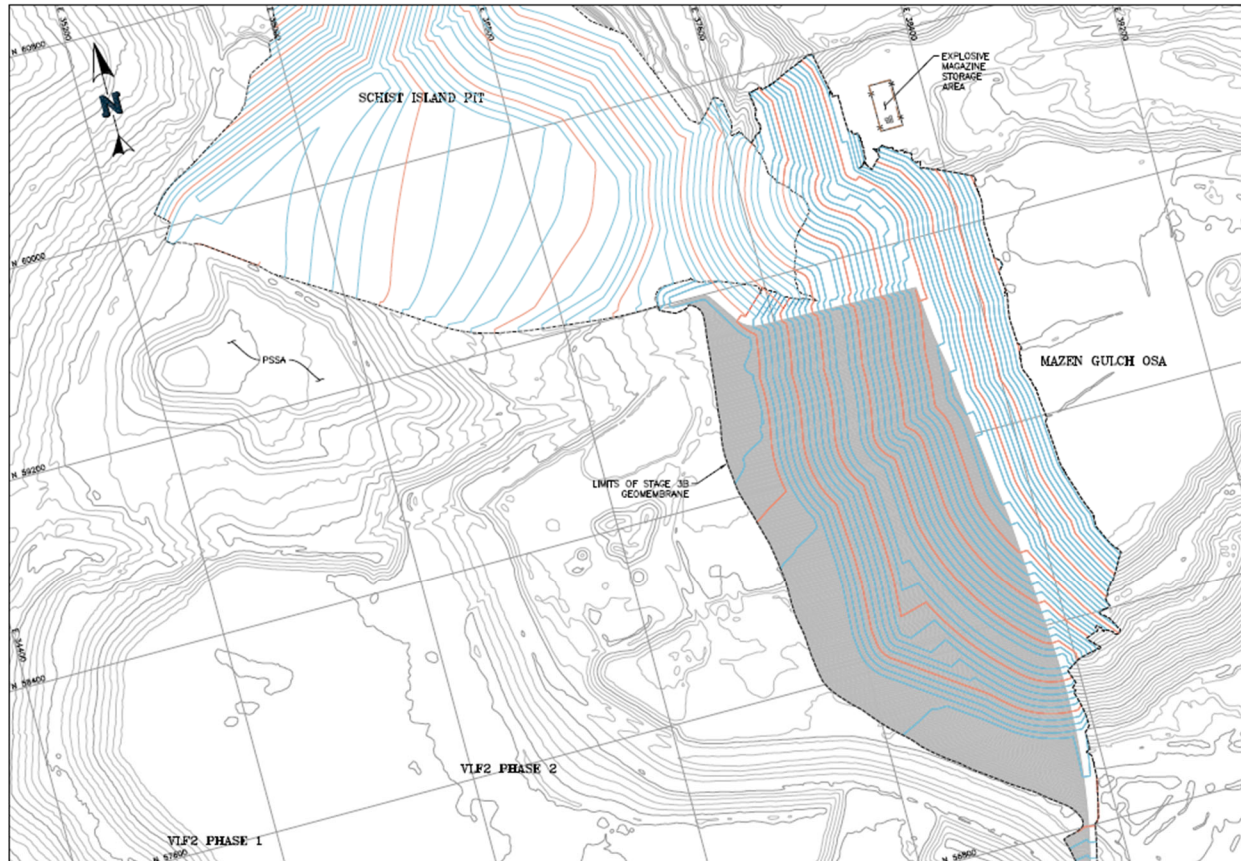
REVISED STAGE B AND STAGE C GRADING PLAN
